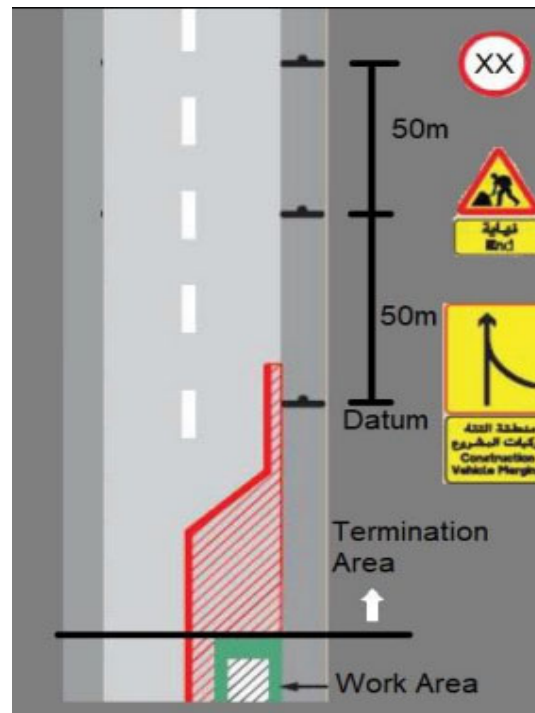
Typical Layout Arrangement of a Termination Area.
